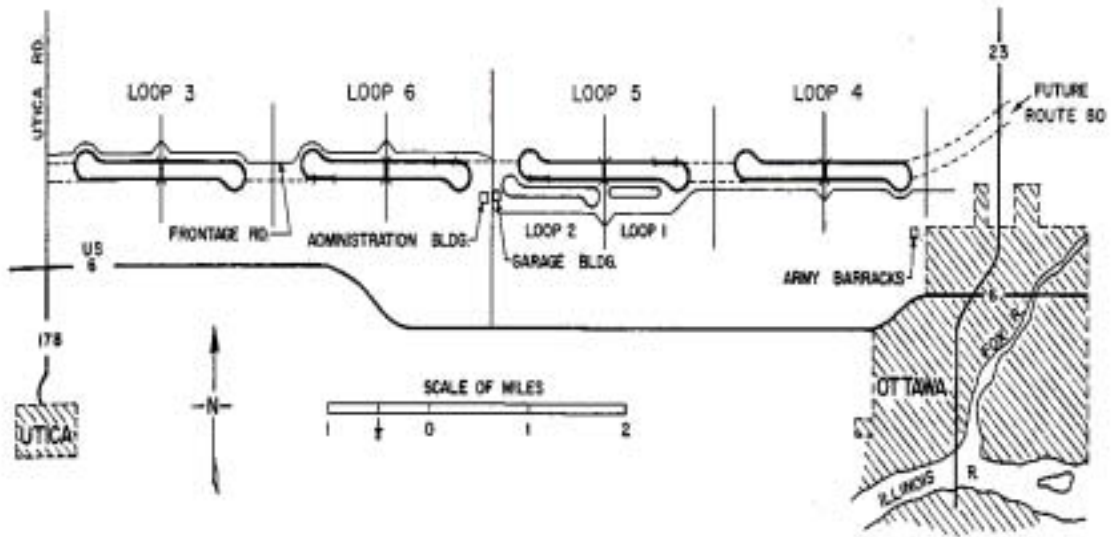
Layout of Early Track Testing via the AASHO Road Test.
